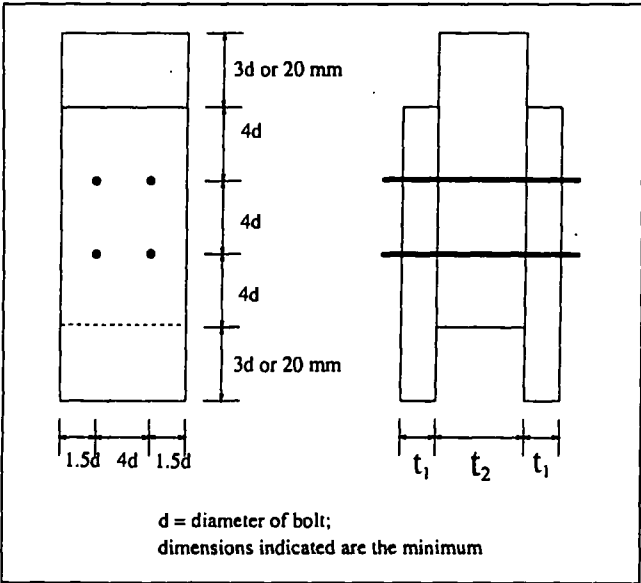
Dimensions of test specimen for bolts of diameter 9.5 mm
